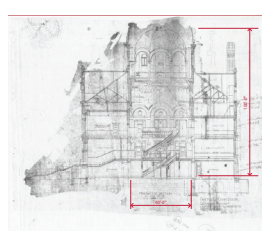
North-south building addition showing the exterior structure and historic masonry.
